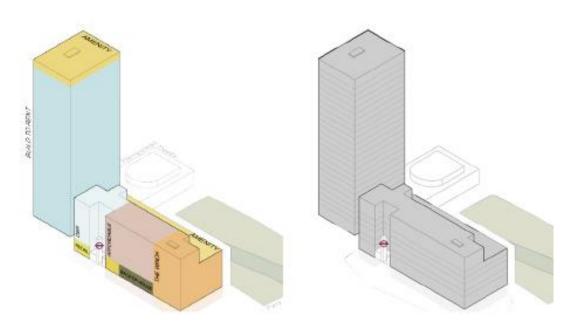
Proposed massing of approved buildings (left) and the proposed (right).
